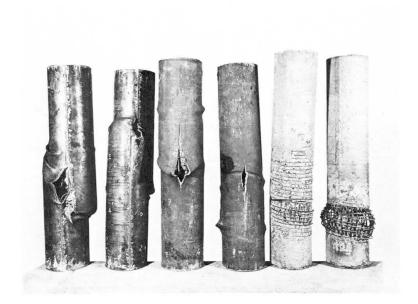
Second series: (H = 2 m): Models after failure tests.
